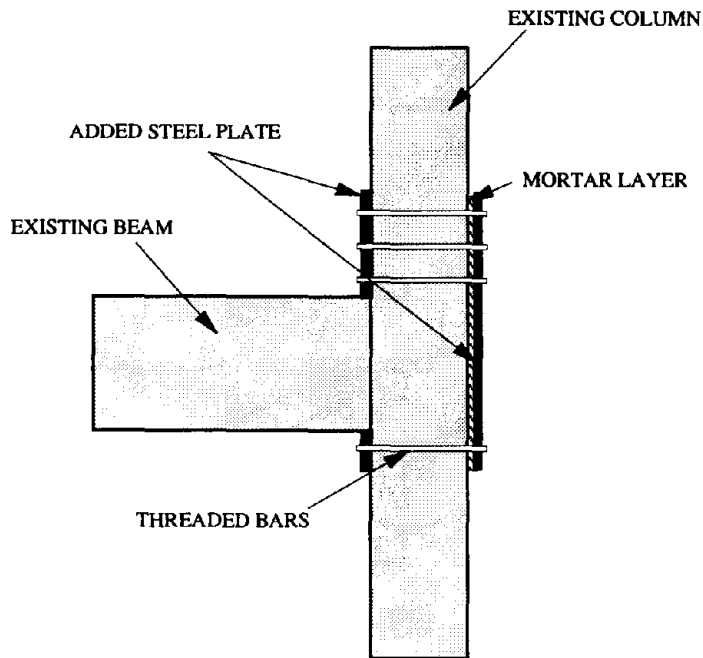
Exterior Beam-Column Joint and Proposed Strengthening Scheme (After Beres et al., 1992)
